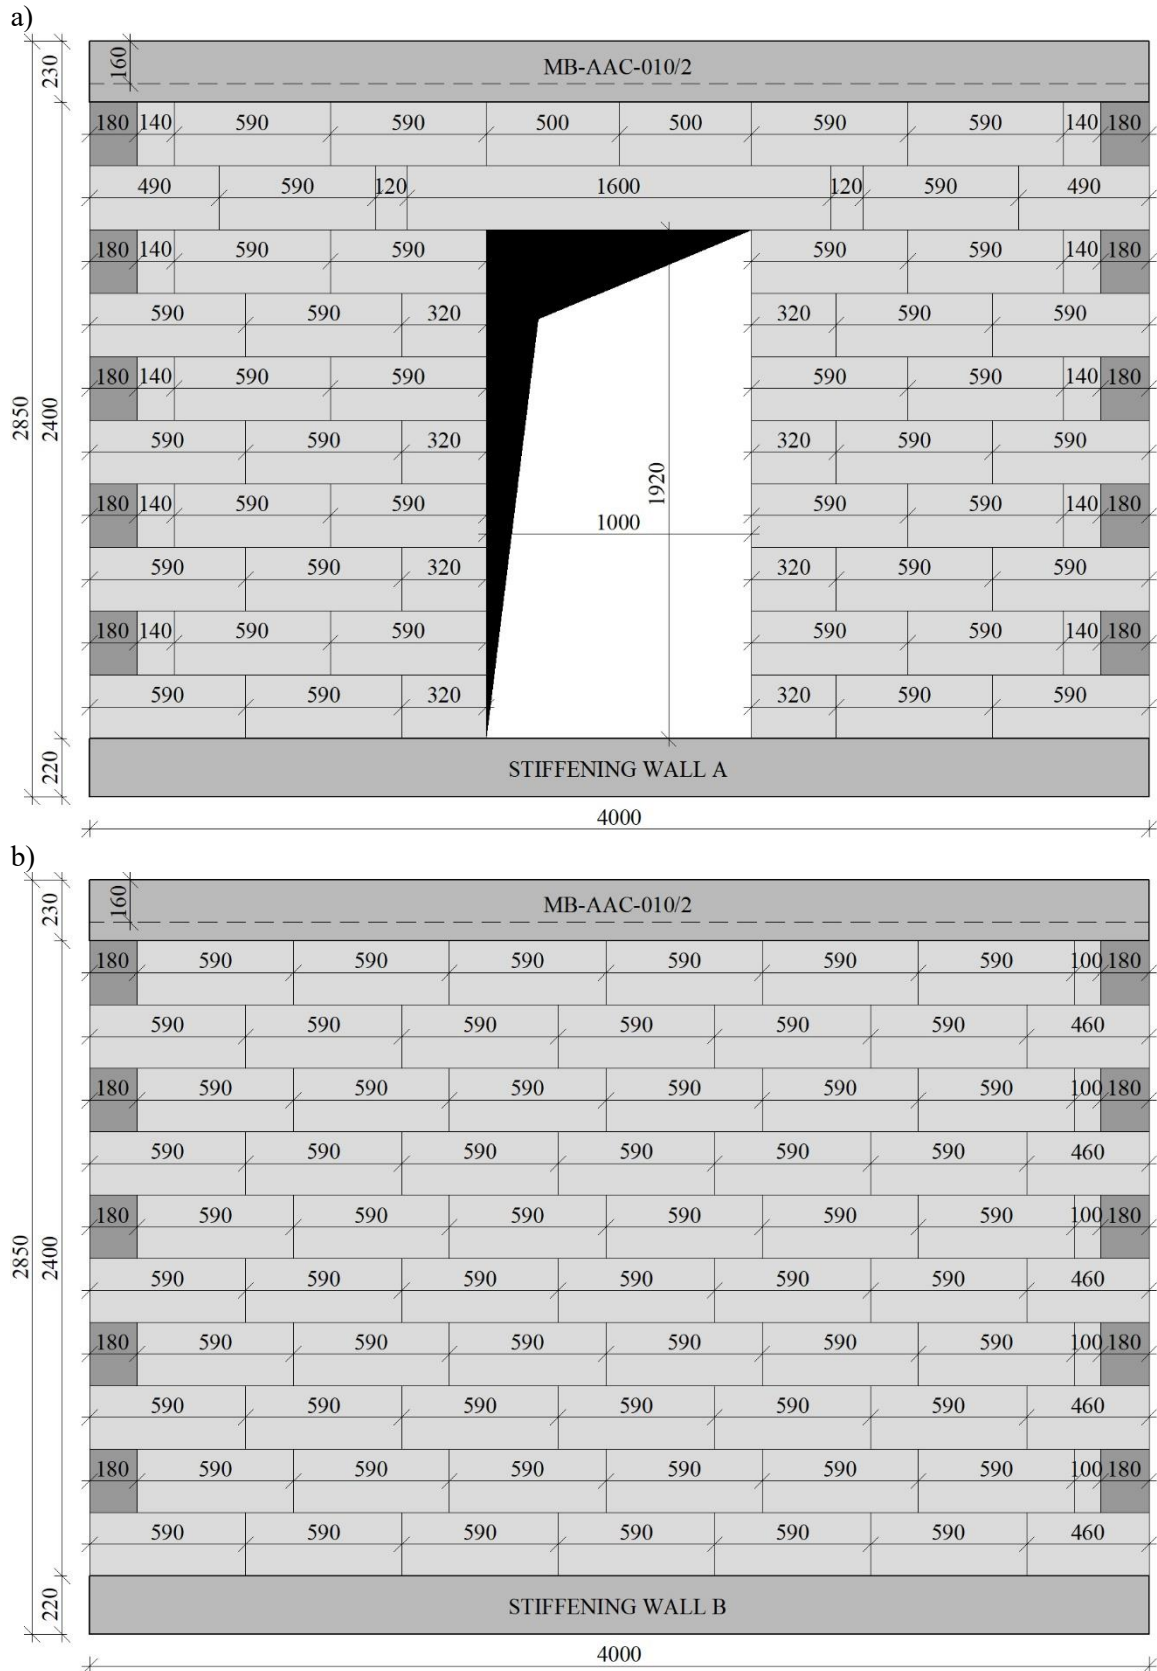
Design of the MB-AAC-010/2 model: a) stiffening wall A, b) stiffening wall B
